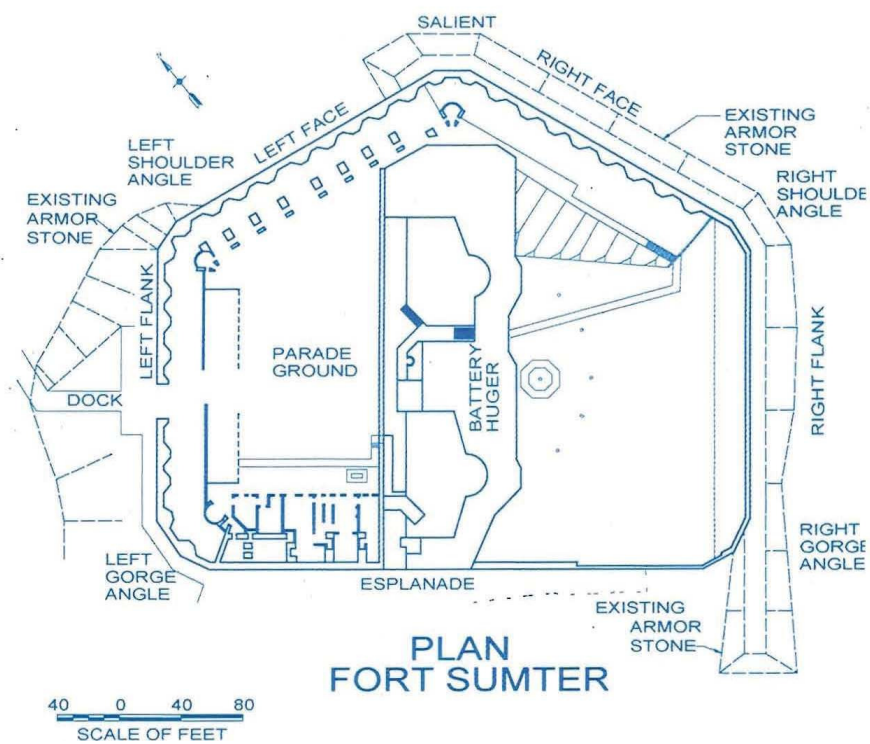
Plan of Fort Sumter, Armor Stone and Outer Wall Structural Study, 1998
